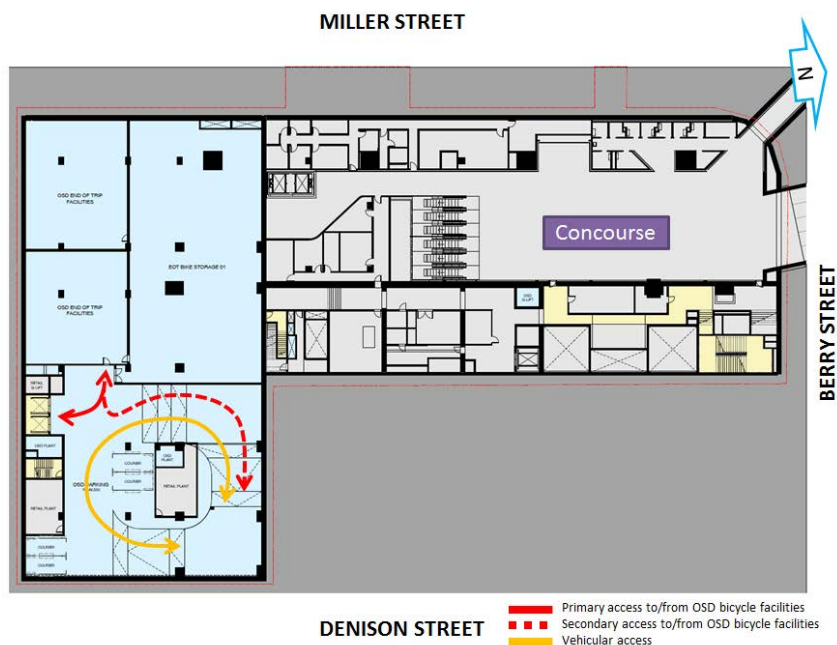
Basement Level 2 – Bike Parking Facilities (area 2)
